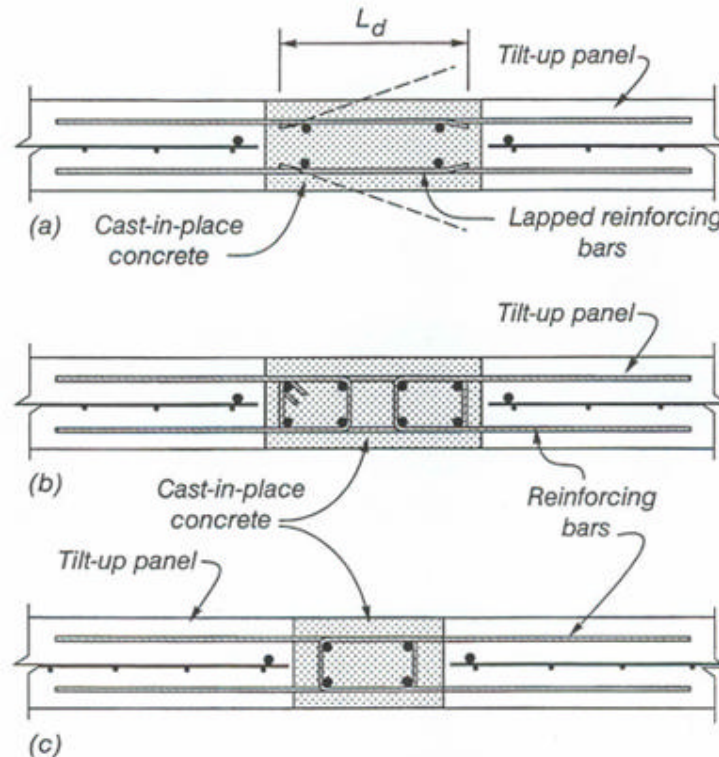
Typical monolithic vertical joints using cast *in-situ* concrete and lapped bars (Restrepo *et al.*, 1996)
